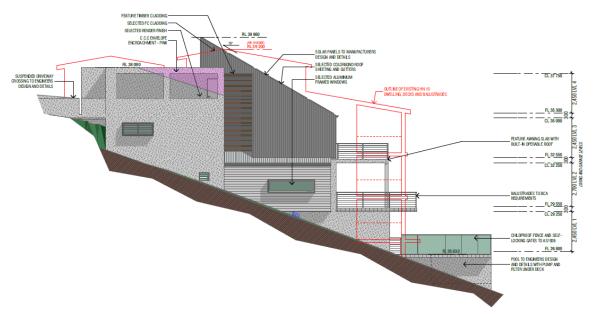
southeast elevation of proposed dwelling including the profile of the northwestern adjoining dwelling outlined in red
